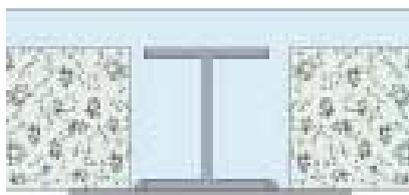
Slim Floor system – steel beam supporting prefabricated elements.
